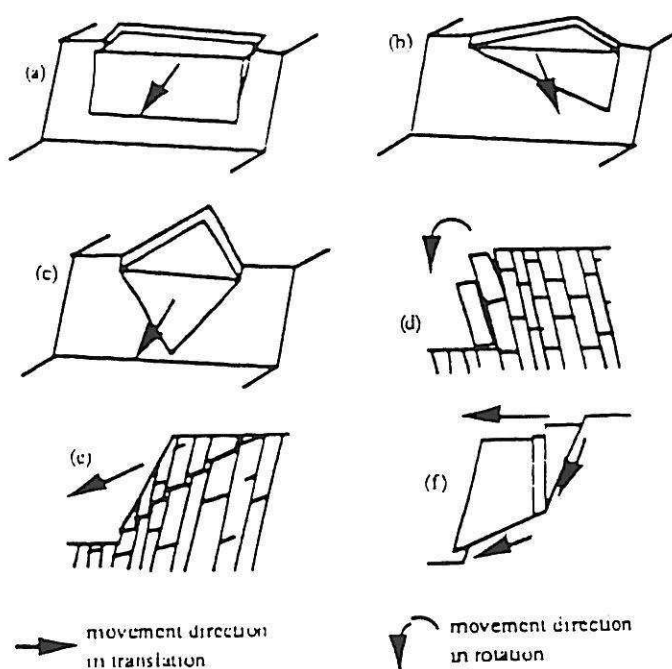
Failure mechanisms analyzed by the DEGRES program: (a) simple plan failure (b) wedge failure with movement on only one plane (c) wedge failure with movements on both planes ; (d) toppling failure (e) step failure ; (f) bi-planar failure (from Tanays 1989)
